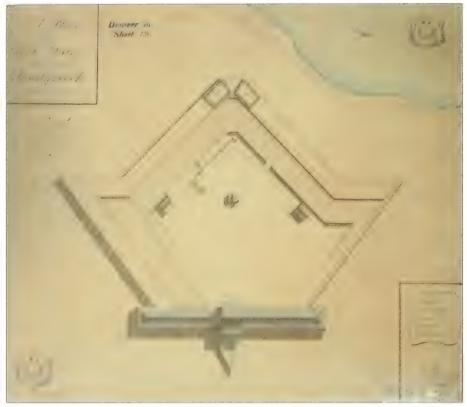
A Plan of Fort Gates Erected on Sandy Hook, 1813. Located a half-mile north of the lighthouse, a wooden stockade called Fort Gates was constructed to prevent British occupation and to secure naval access to New York City during the War of 1812 (James J. Lee III and Lauren Laham, Historic Structure Report: Battery Potter, Mortar Battery and Battery Gunnison, United States Department of the Interior, National Park Service, 2007).
